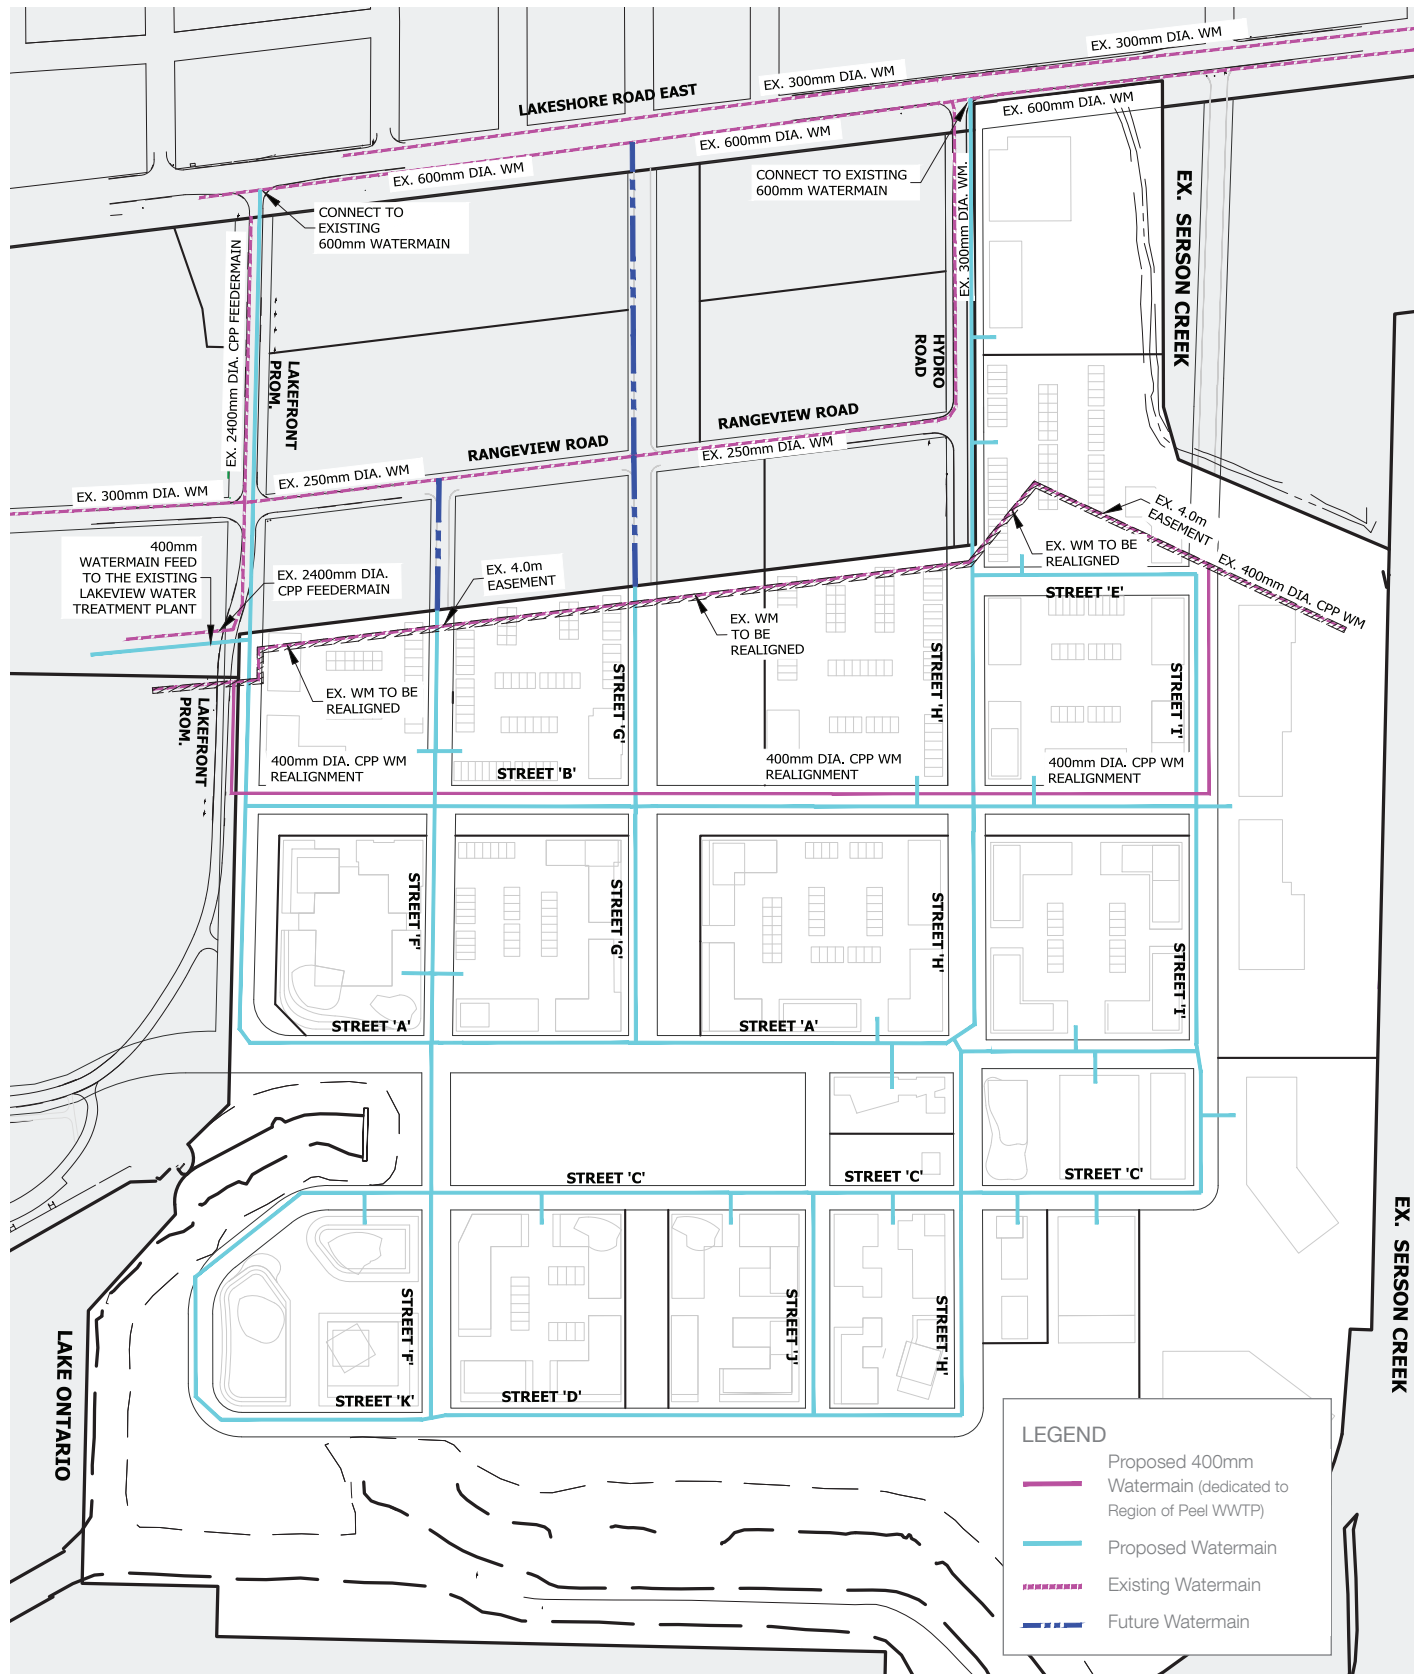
Preliminary Lakeview Village Watermain Plan
